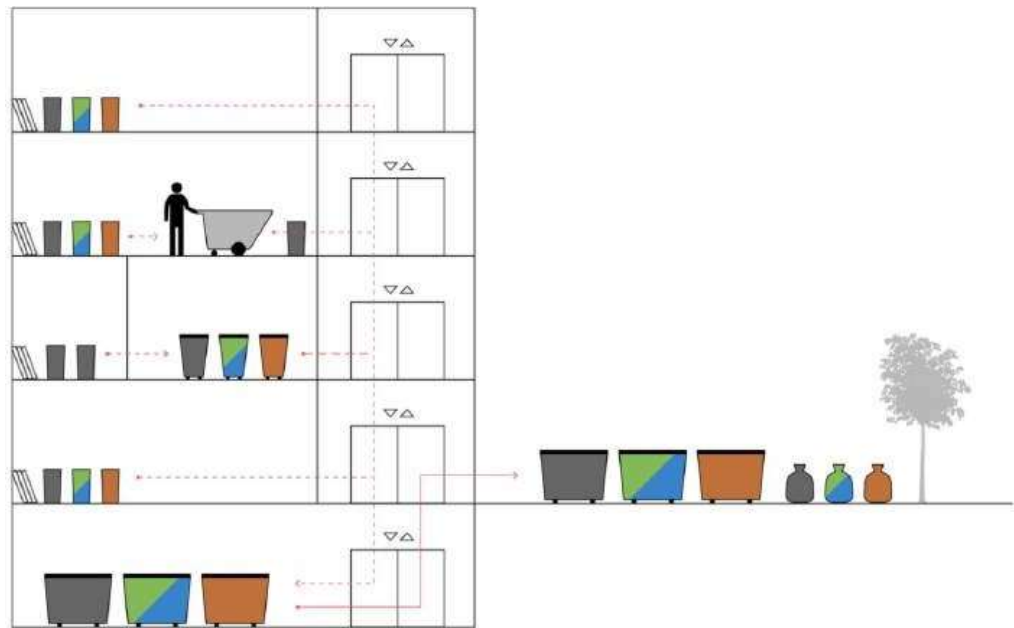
Typology 3: Elevator to shared storage (Zero Waste, n.d.)
